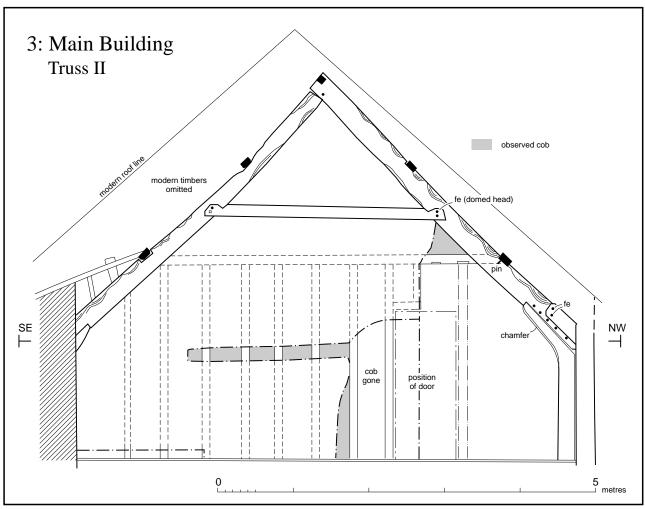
Measured drawing of a typical roof truss over the main range and of a primary partition dividing the first-floor chambers.
